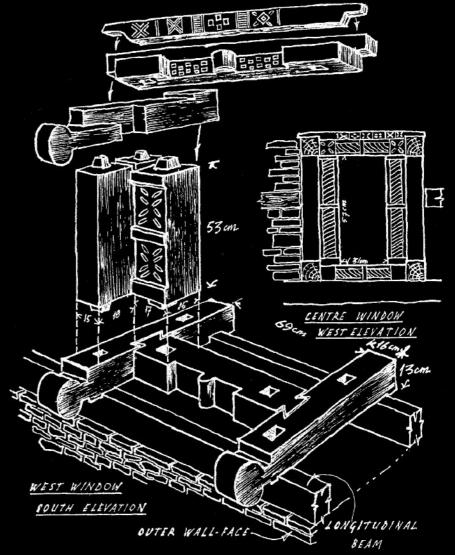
EXPLODED VIEW OF A WINDOW IN SOUTH WALL SHOWING CONSTRUCTION AND DECORATION, AND ELEVATION OF THE CENTRE WINDOW OF SOUTH ELEVATION
